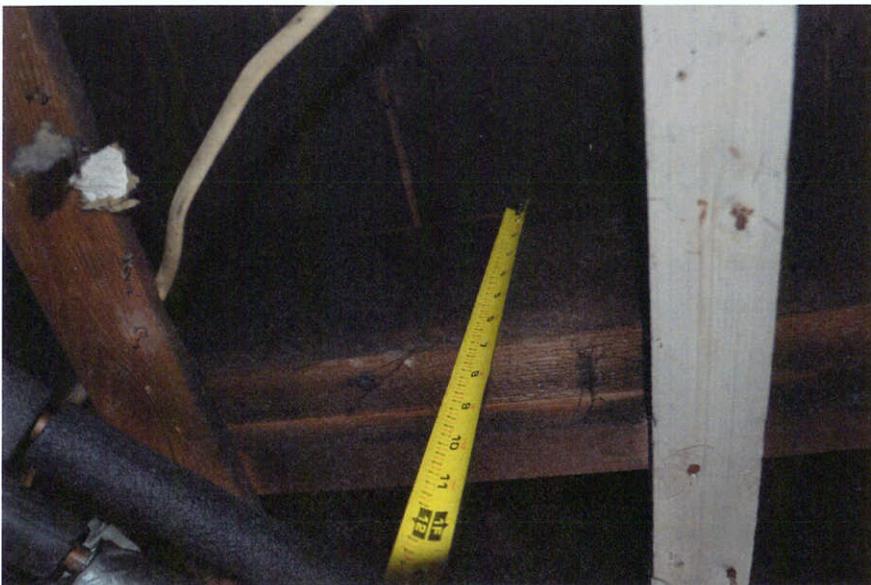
In some areas 7" joists were added for support to the second floor. Strapping was also added and the original exposed chamfered beams were encased under drop ceilings.
